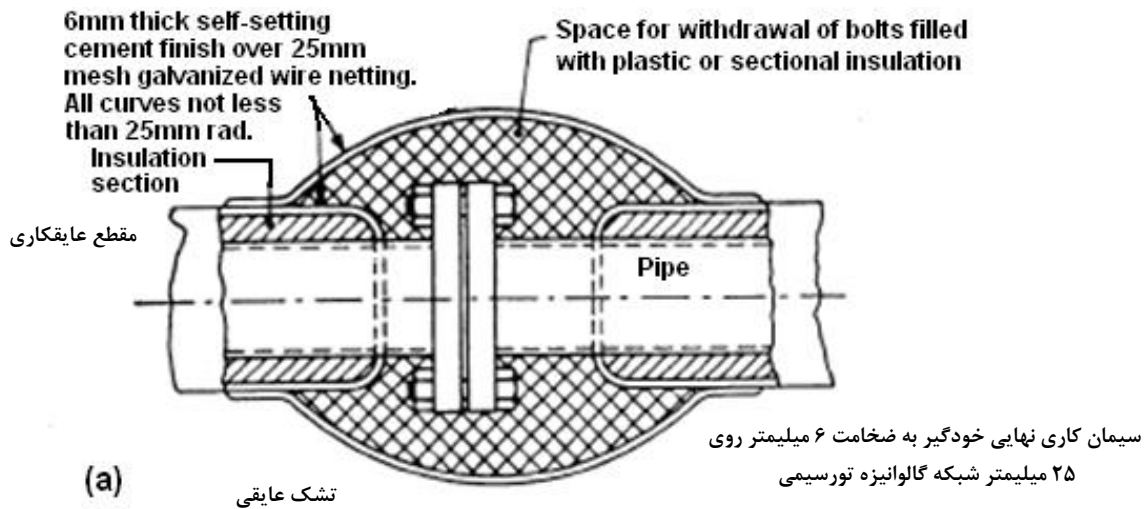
TYPICAL METHODS OF INSULATING PIPE FLANGES
